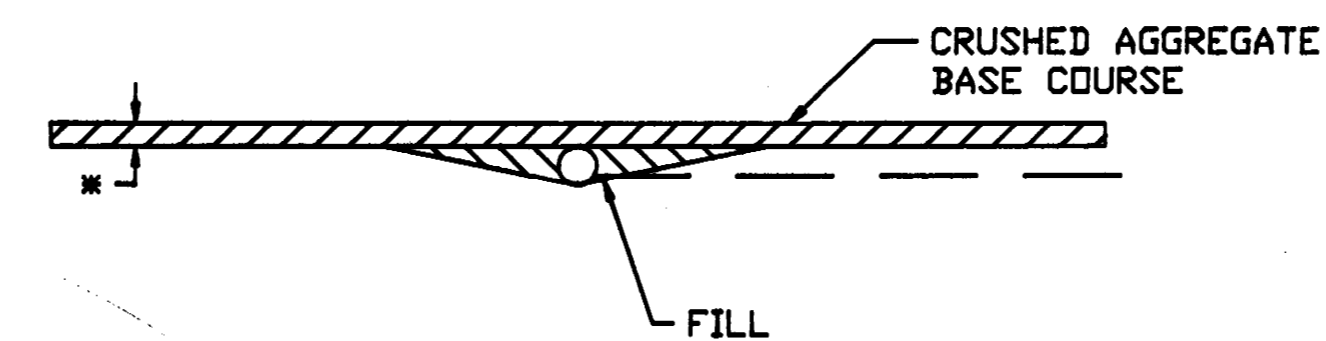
DETAIL OF INTERSECTION TYPE 'C' MODIFIED
